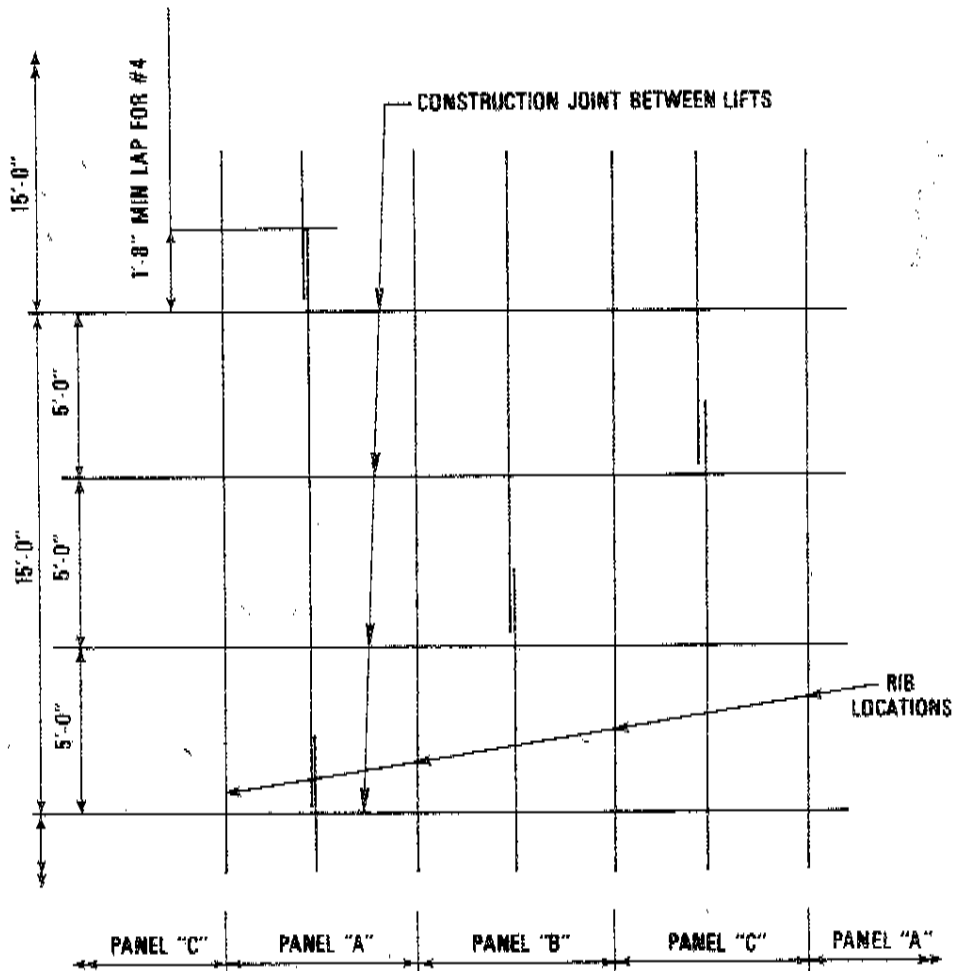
Elevation and Plan View of Cooling Tower Unit No. 2
